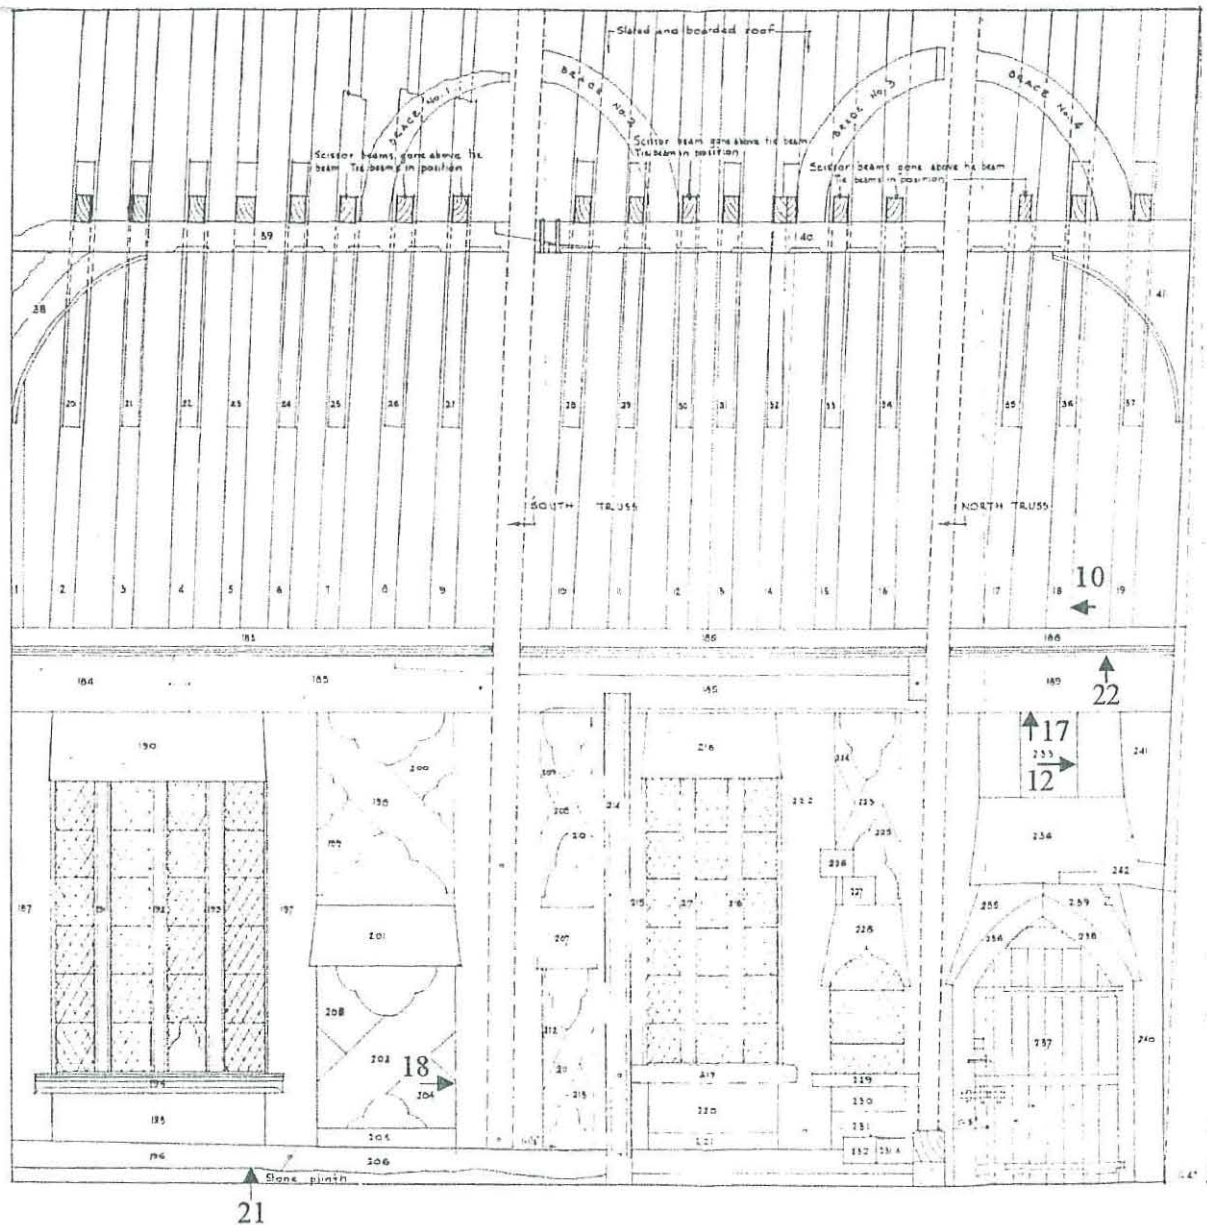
Internal elevation of west wall. Hall range, Baguley Hall. Location of samples 10, 12, 17, 18, 21, and 22
